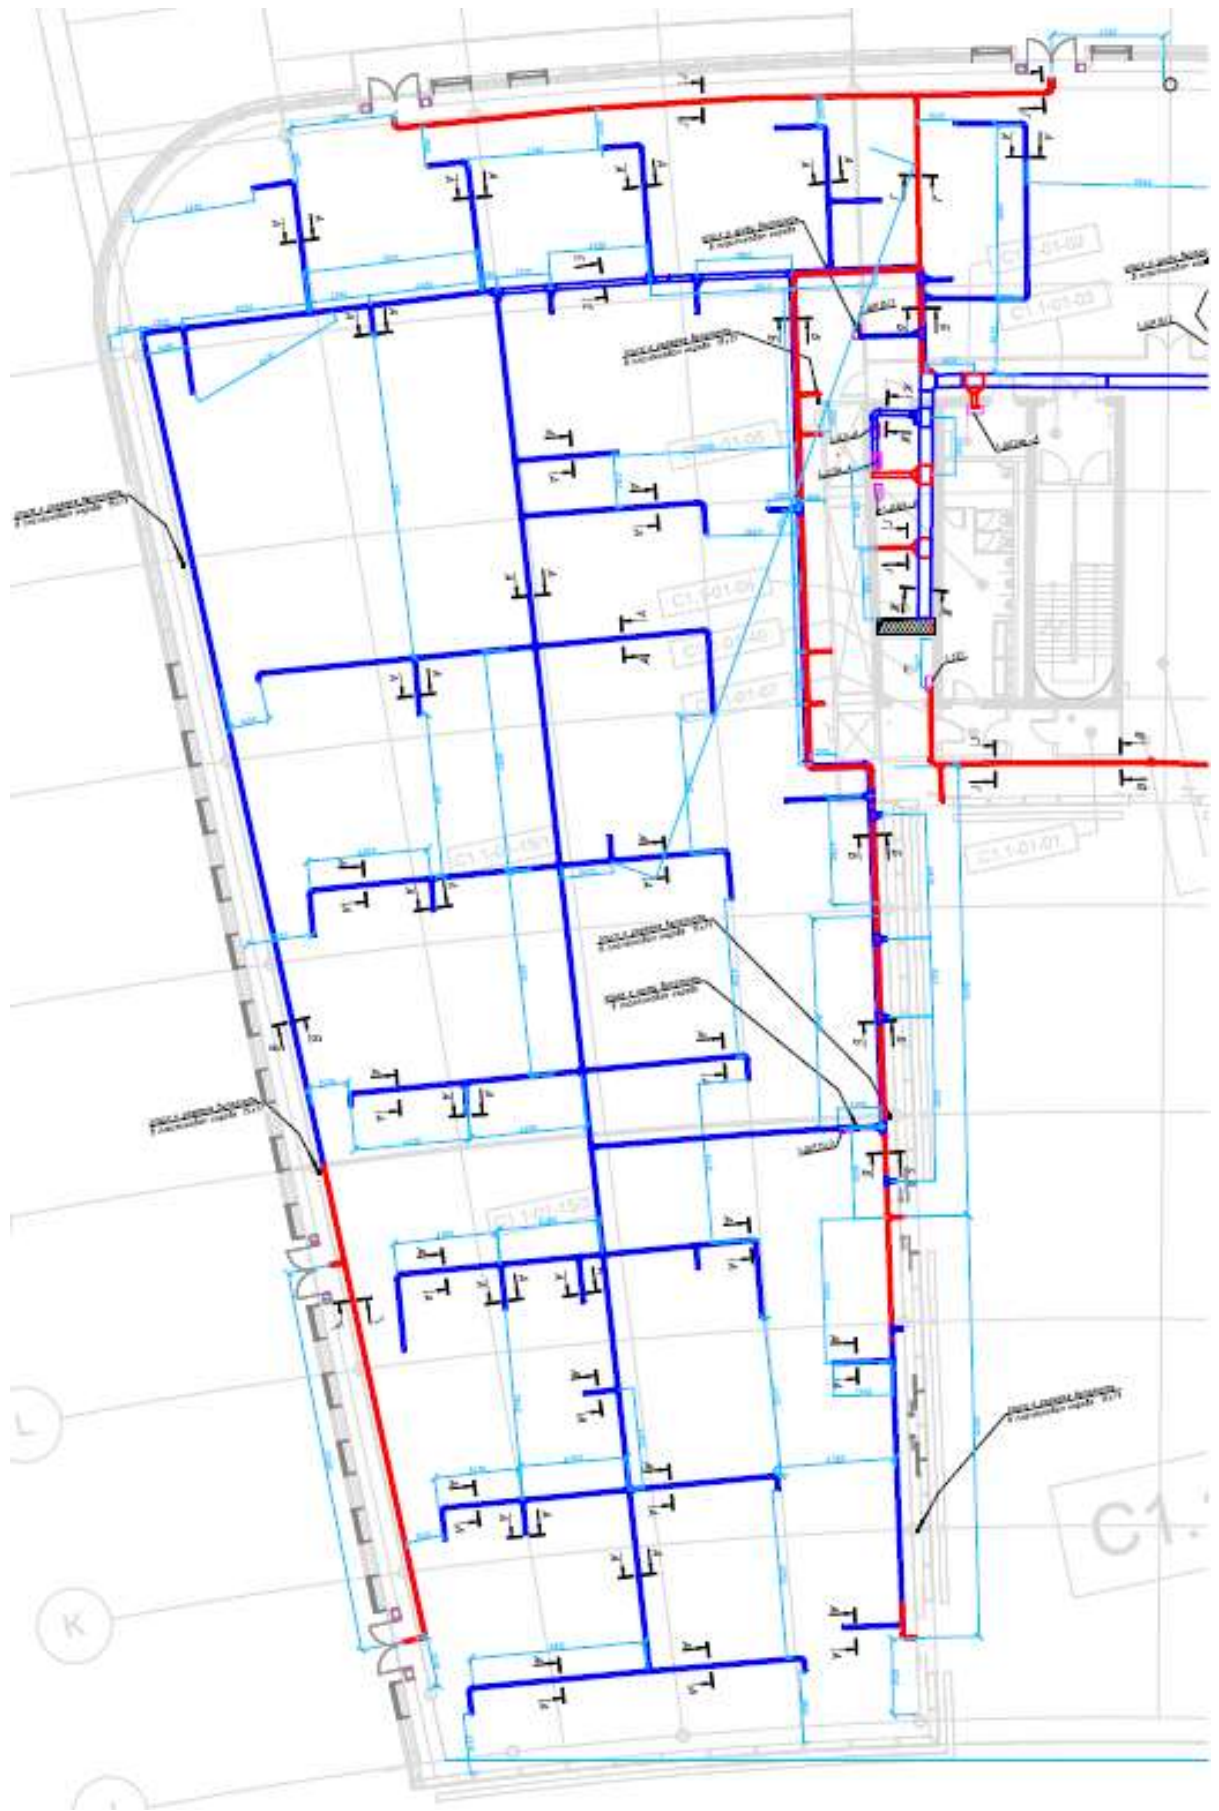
Rough layout of cable chutes in the Official Participant's Pavilion ceiling space.
